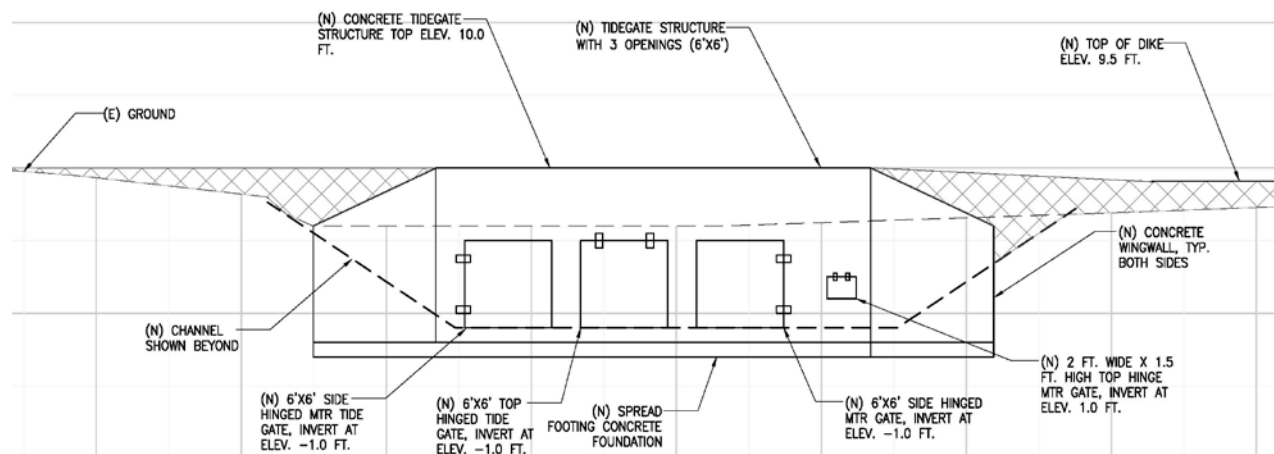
Cross section on view from Swain Slough of proposed replacement tide gate structure.
